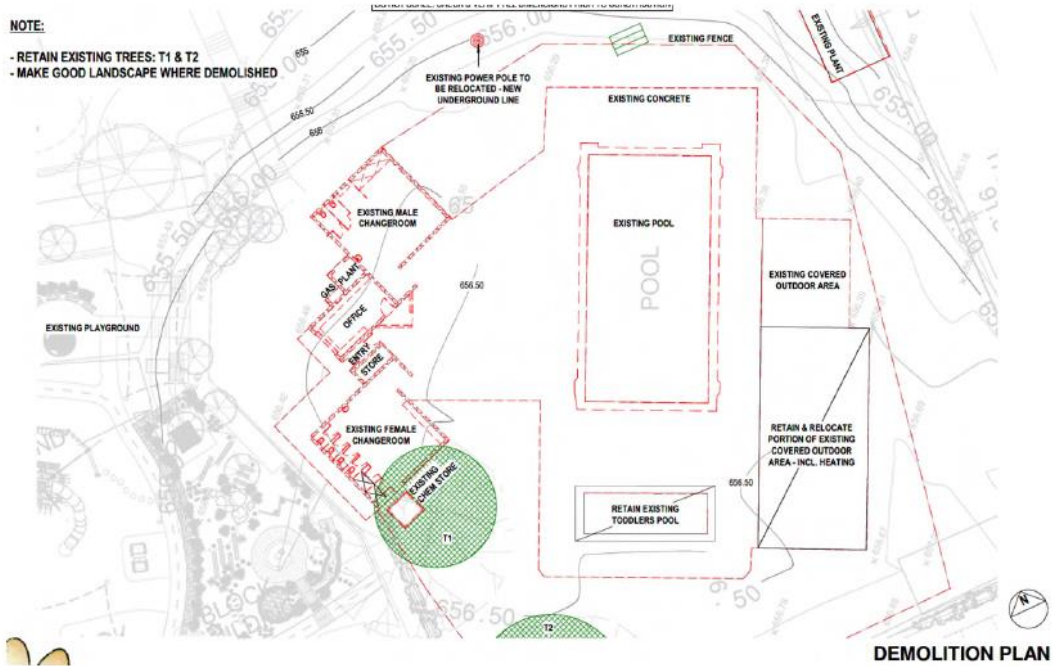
Proposed Demolition Plan (Prepared by Paul Barnett Design Group)
